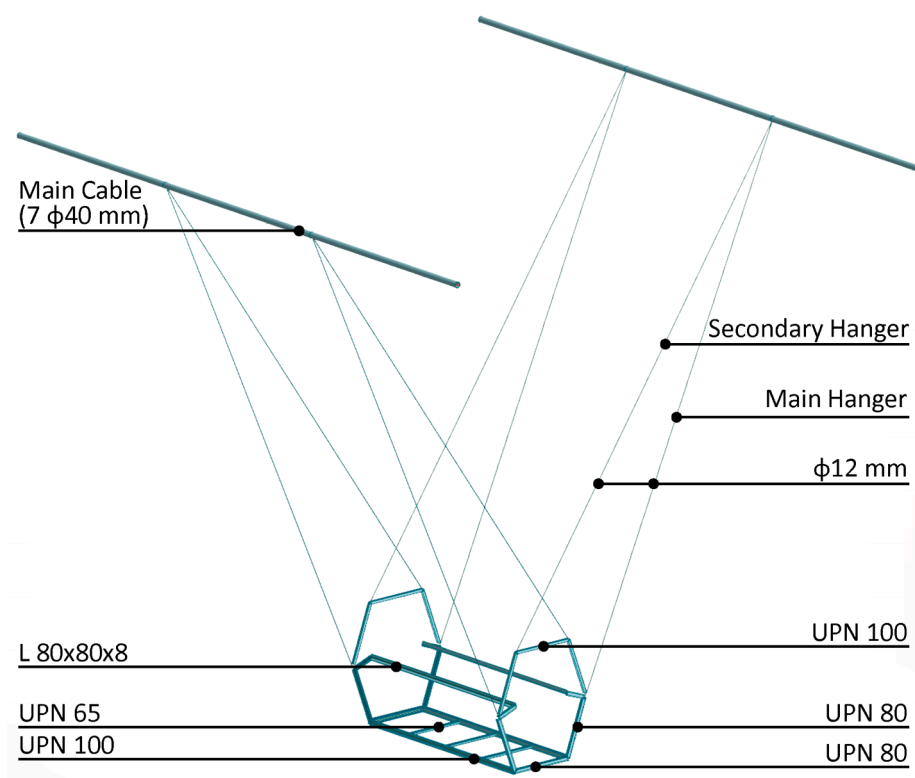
Schematic of the structure module of the bridge and profiles of the construction elements.
